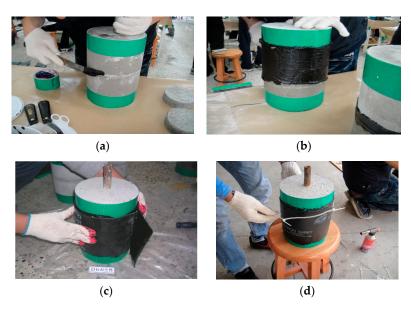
Waterproofing membrane installation process illustrated (a) mortar sections placement and surface treatment; (b) primer, adhesive, or other adhesion material application; (c) waterproofing sheet application; (d) Test specimen complete and ready for testing.
